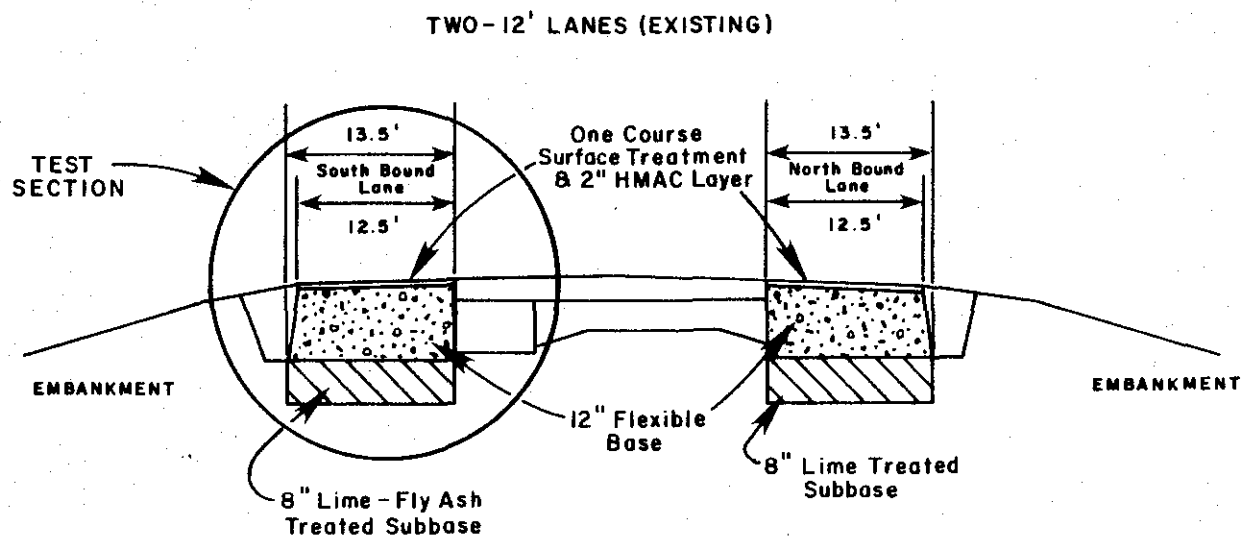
Typical section and layout planview of Test sections on US 59 in Panola County, Texas - Site No. 2 (6).
